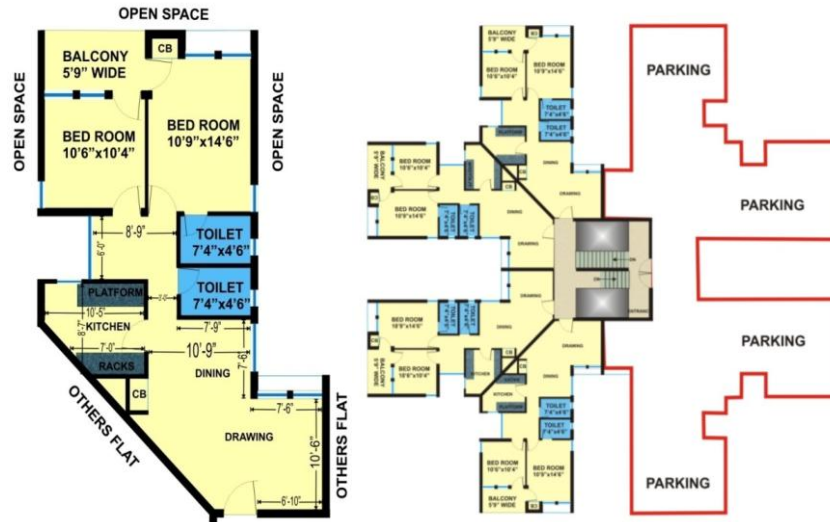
Individual Apartment Floor Plan & Ground Floor Plan: Individual Block
